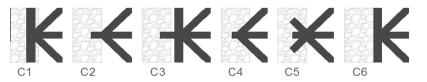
Different type of wall-to-half-timbered wall connections (adapted from Cardoso [11]).
